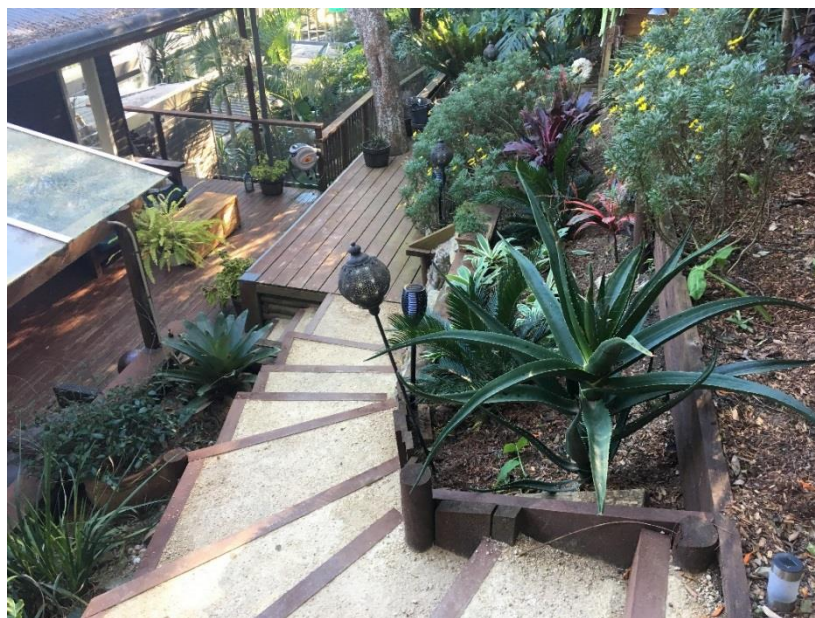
General view of landscaped gardens and decks at rear of house, facing west.
